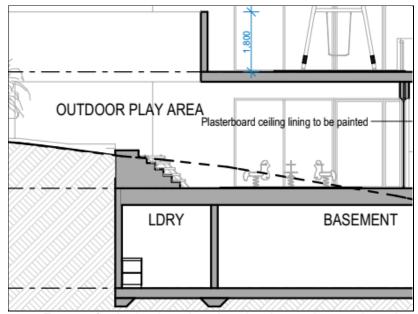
Extract of submitted section plan showing sunken outdoor play area. Source: Designcorp Architects, dated: 05/09/2019
